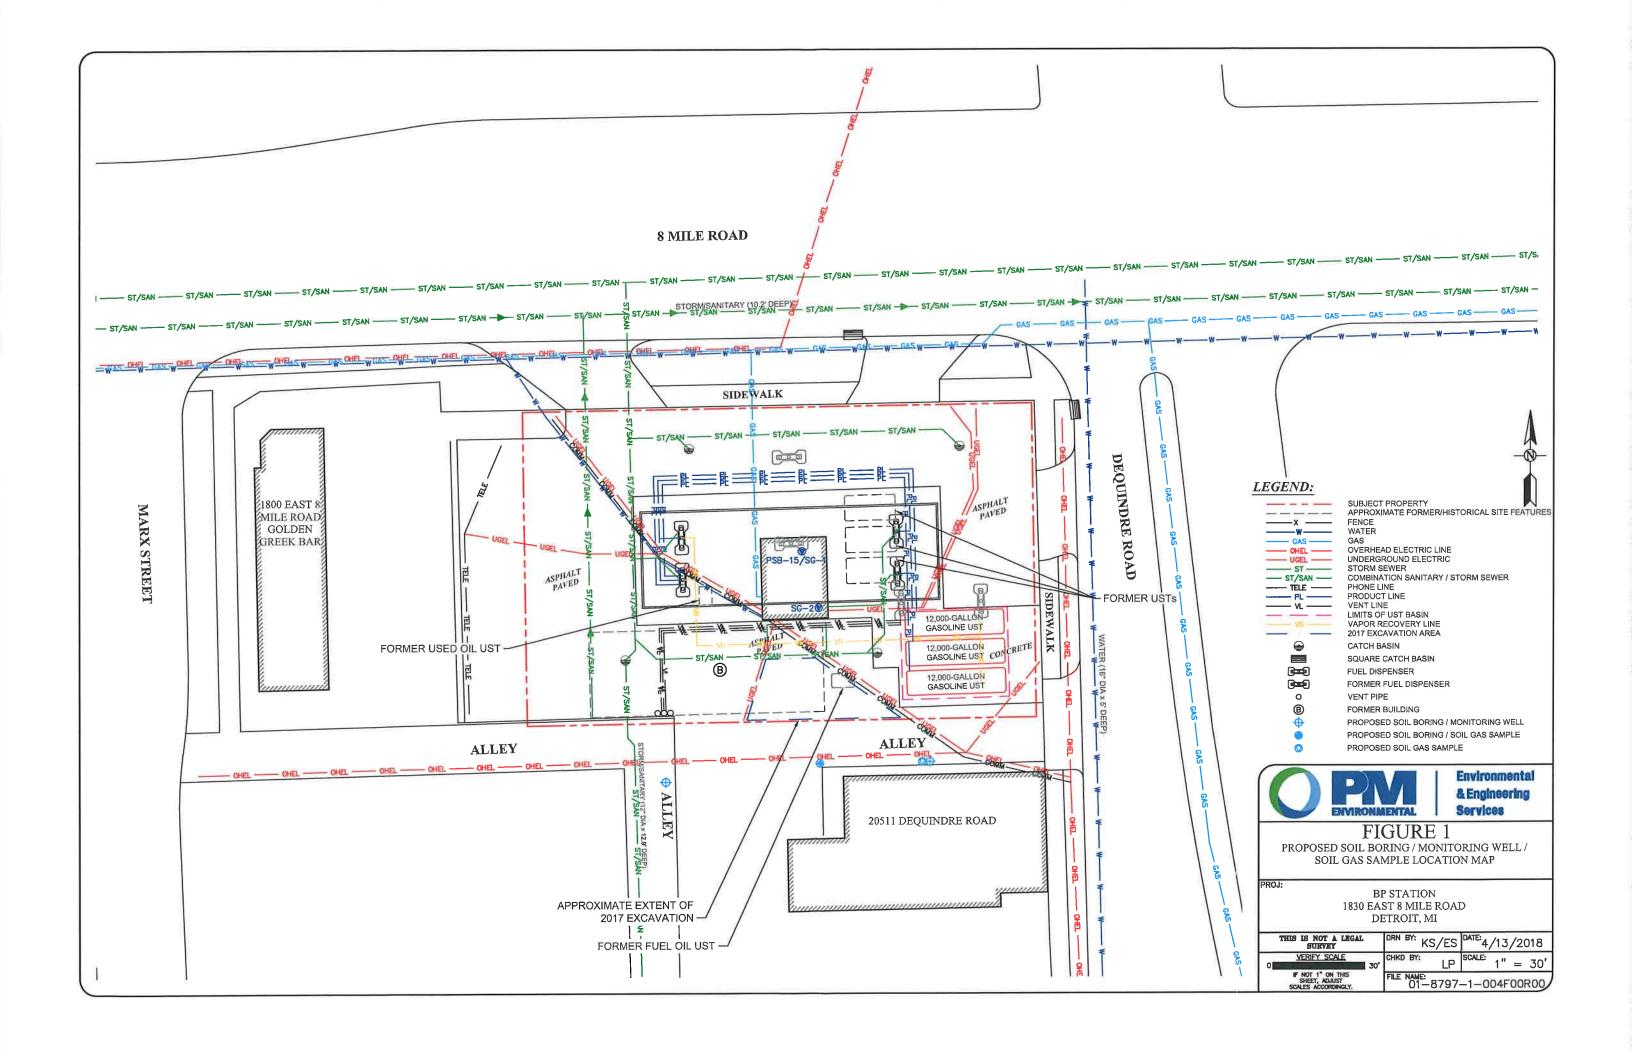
Proposed Soil Boring/ Permanent Monitoring Well/ Soil Gas Sample Location Map Typical Soil Gas Sampling Point Diagram
